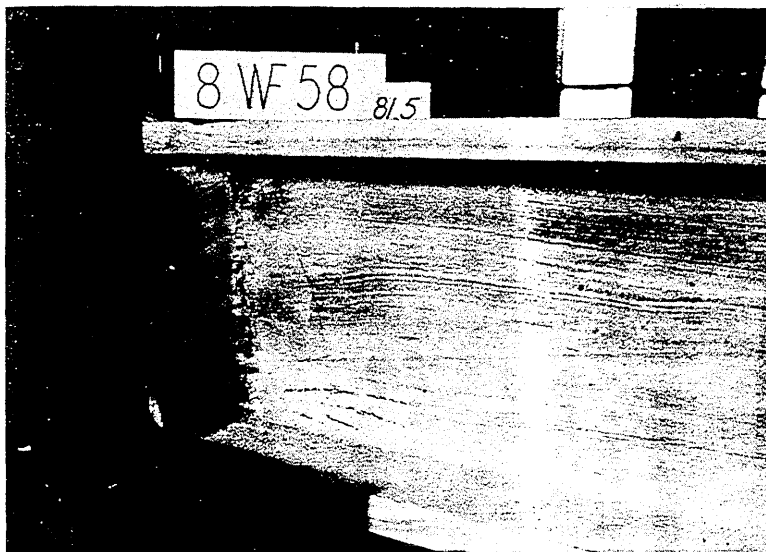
BEAM B1 - V-M SECTION - LOAD = 81.5 KIPS
